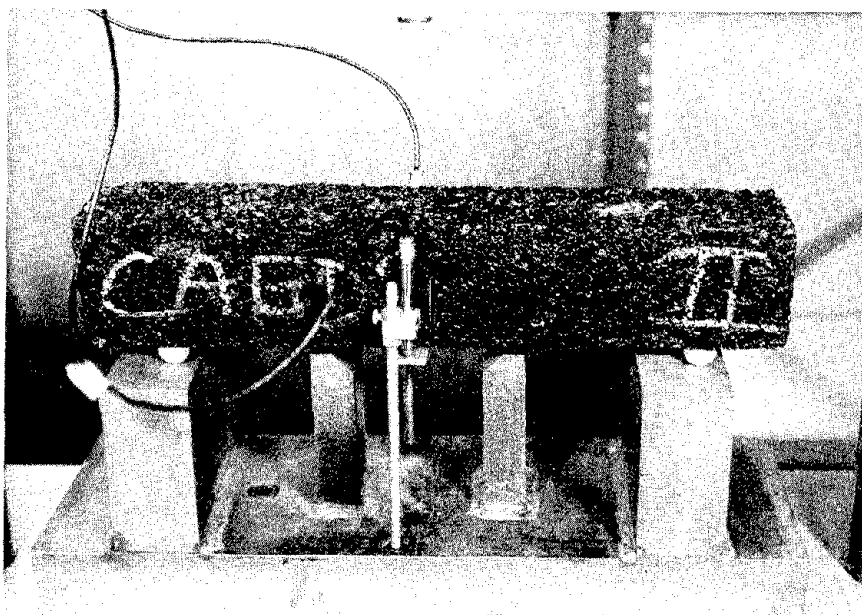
Photograph of fracture mechanics testing fixture.
